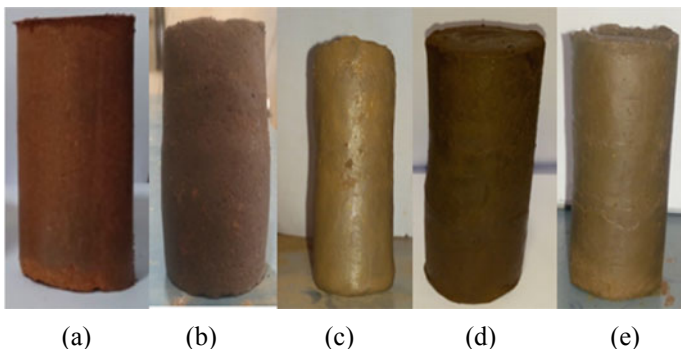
Failure observed after loading with and without geotextile. a specimen before loading, b specimen without geotextile, c specimen with one-layer geotextile, d specimen with two-layer geotextile, e with three-layer geotextile
